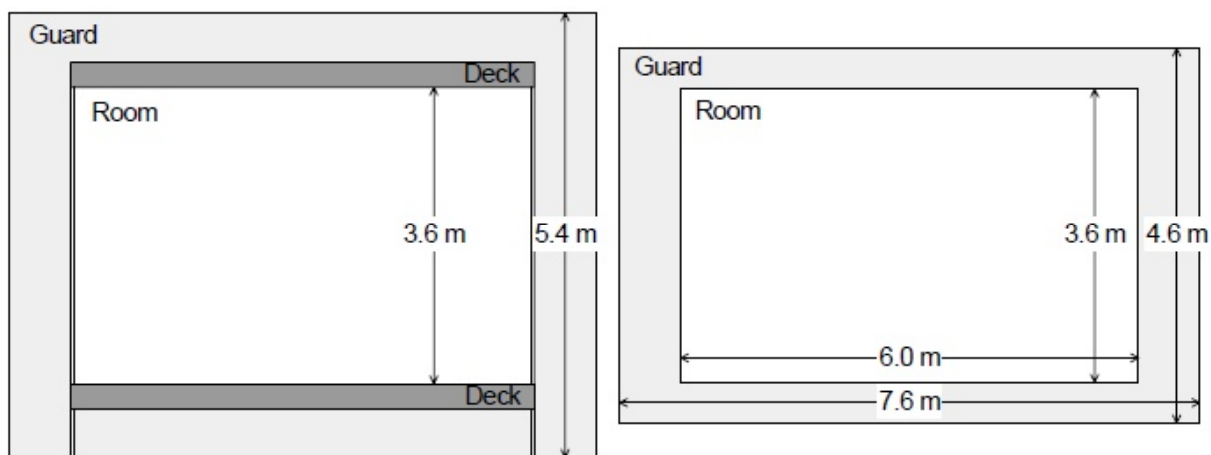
Front and plan view of the test facility with its corresponding dimensions
